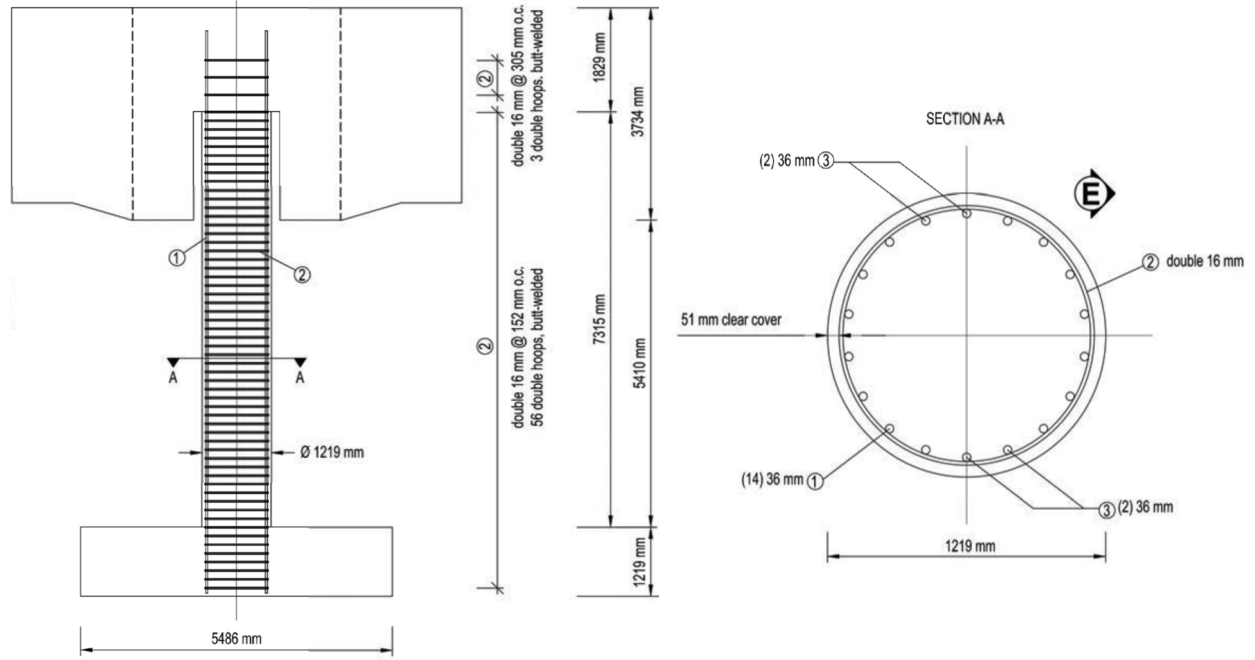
Full-scale bridge column details and dimensions [Schoettler et al. 2015].
